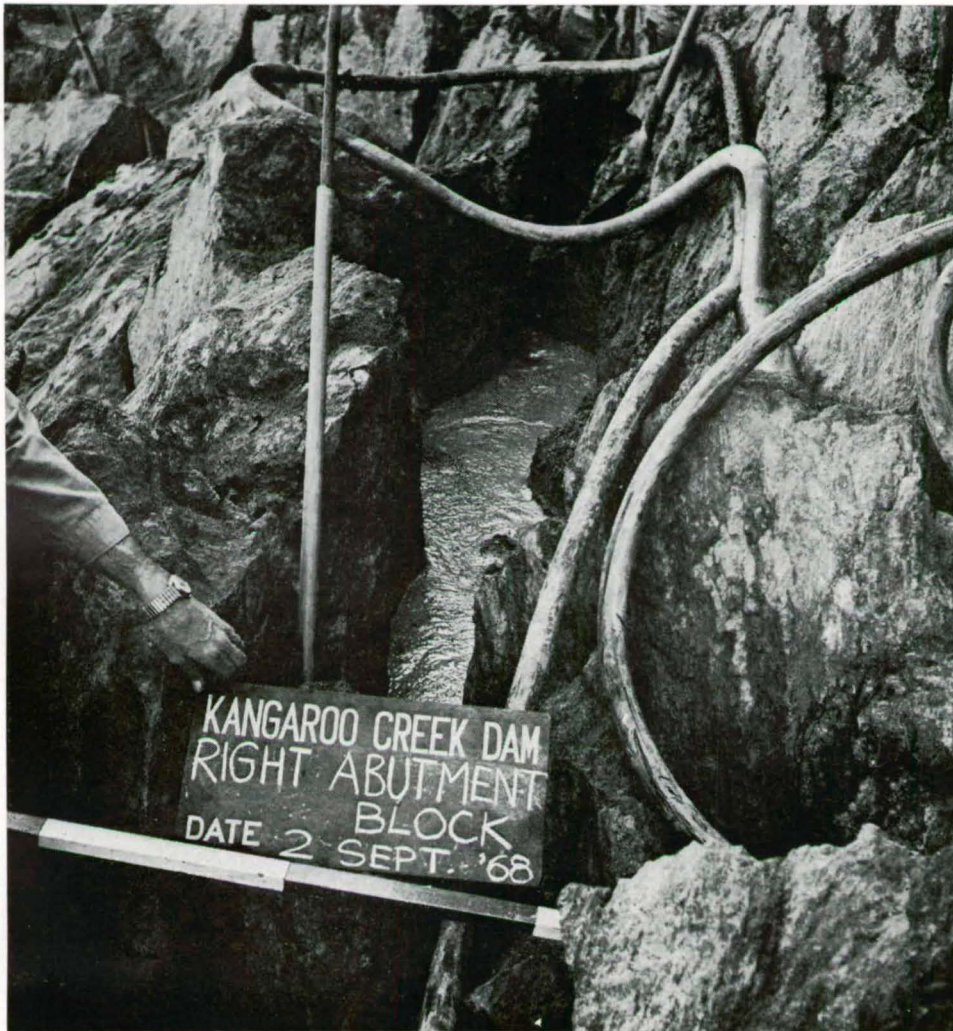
Dental treatment of gaping joints in floor of right abutment block excavation. After clean-up joints were filled with slurry of 1 to 3 sand/cement mortar.
